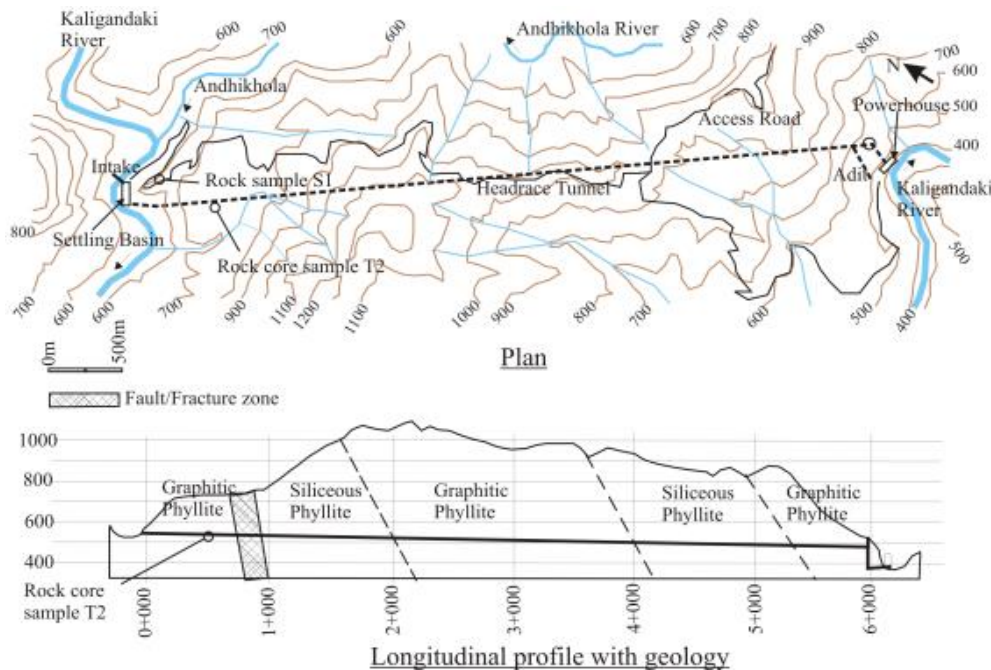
Longitudinal profile and topography of the headrace tunnel in the Kaligandaki 'A' hydropower project (Panthi, 2006).
